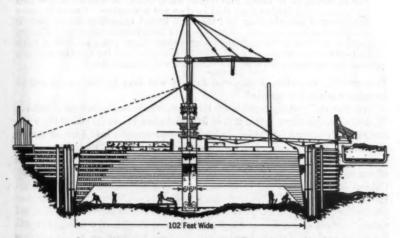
Arrangement of Excavating Machinery, Brooklyn Tower Caisson
